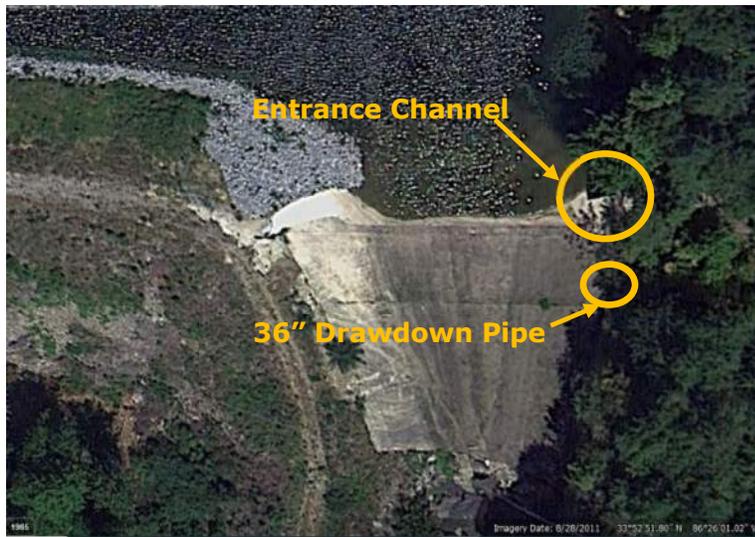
Concrete Spillway with Location of 36" Drawdown Pipe
